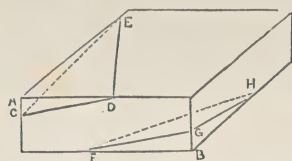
WOODEN PLUG FOR BRICK WALL.
